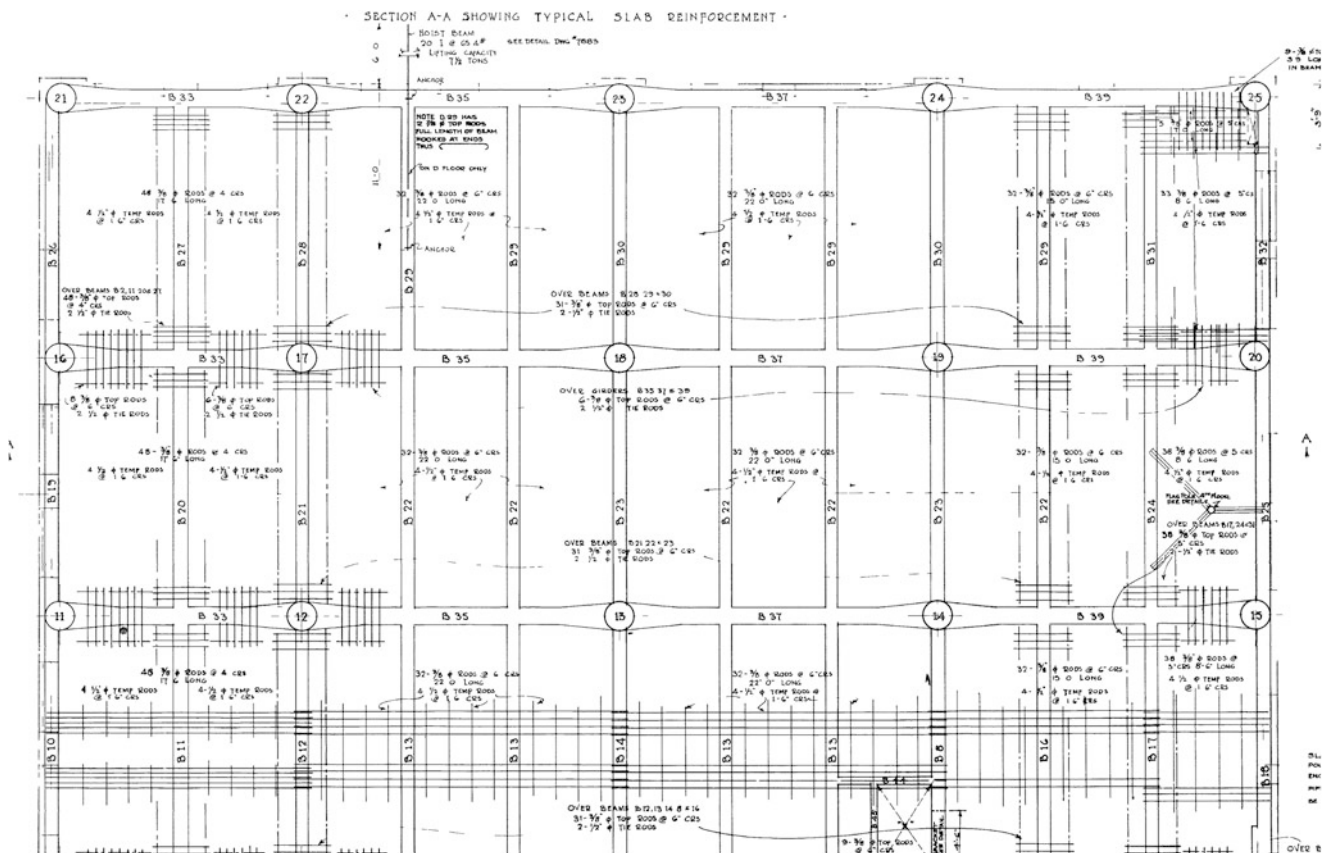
Portion of original 1925 structural drawings of Structure #1
